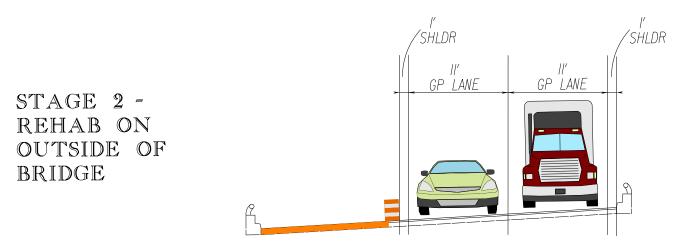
Drums on outside of I-64 WB bridges over Little Creek Rd and Granby St
